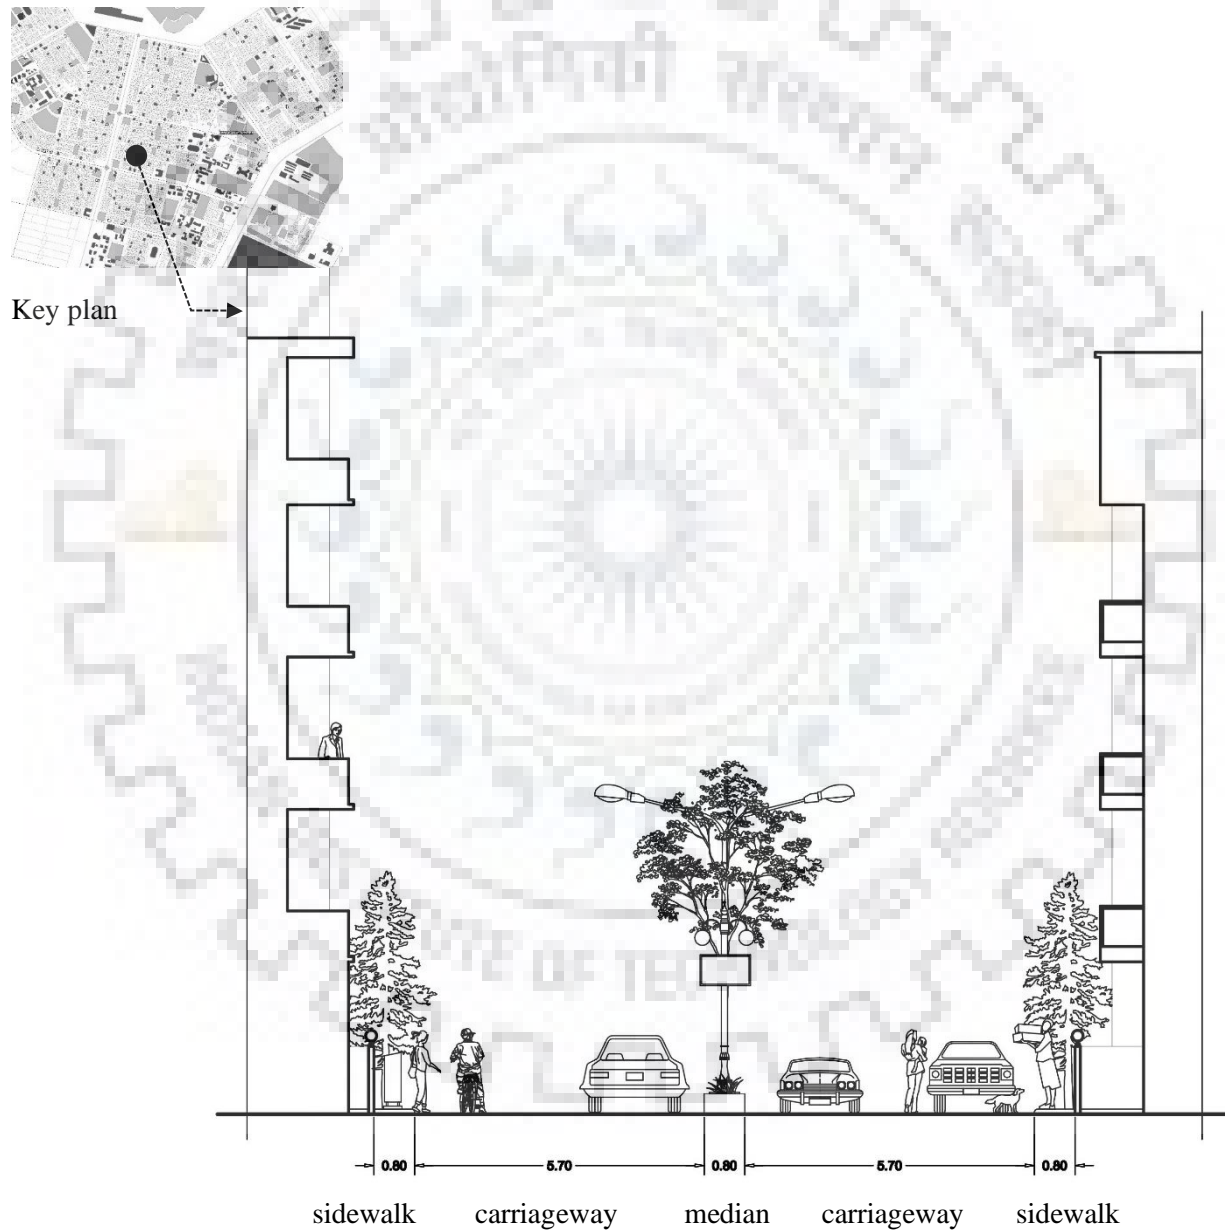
Street section of 1A cross road, Salt Lake Sector 3
